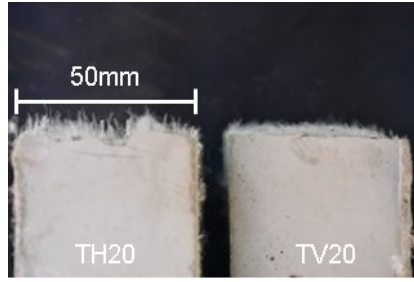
Tensile test specimen (Note: 1 mm = 0.0394 in.)
